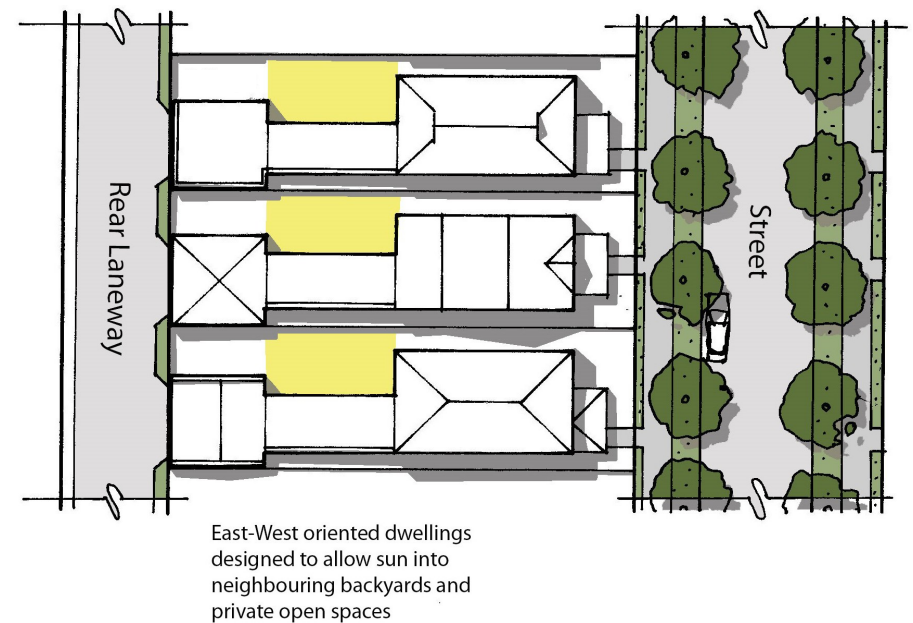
Plan showing sunny backyards with taller elements placed closer to the street
